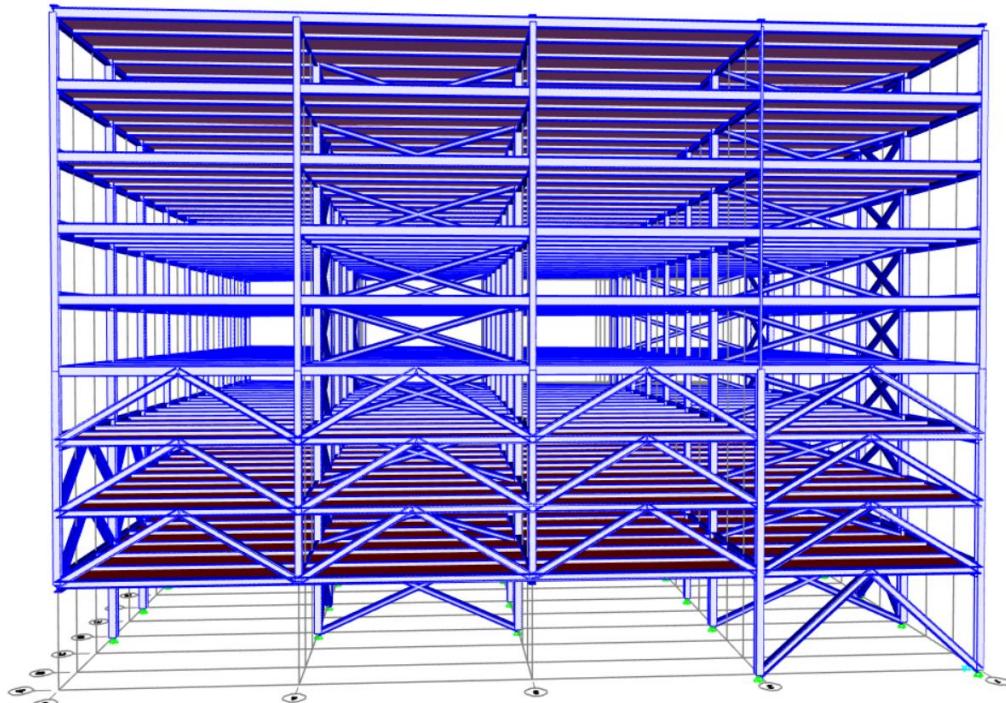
Elevation Structural Model for Proposal 2 (SAP2000)
